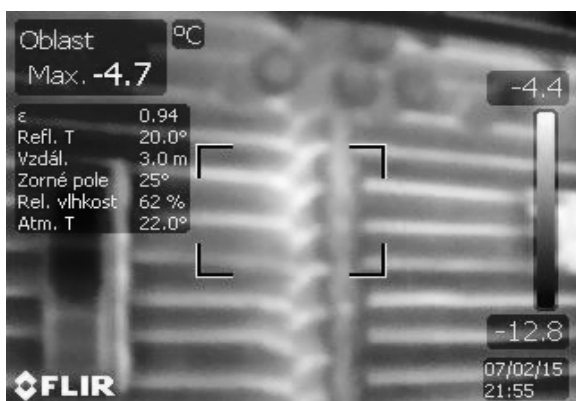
Similar detail – above trees cut. Gerstein house. Infrared photo I.Krčmář 2015
